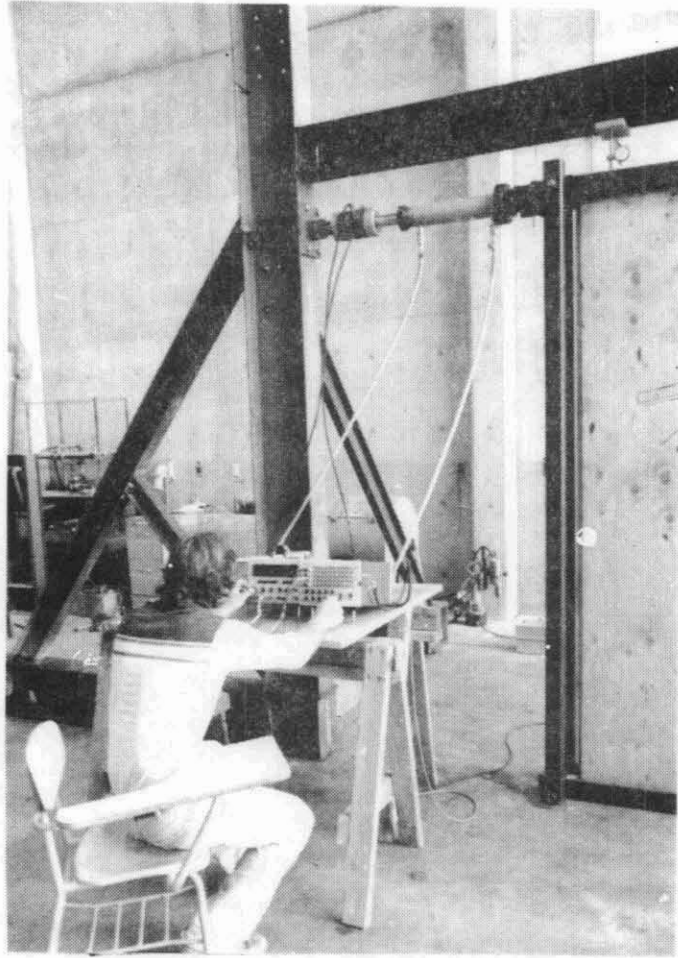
Racking Test Set-up: Details of Pinned Frame & Load Application and Measurement
